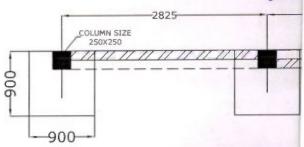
DETAILS SECTION OF BOUDARY WALL SCALE = 1:25
